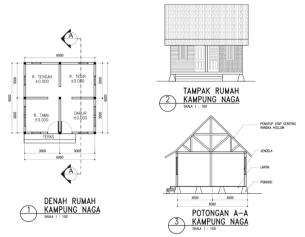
Floor Plan and Section of Kampung Naga (Source: Author, 2016)
